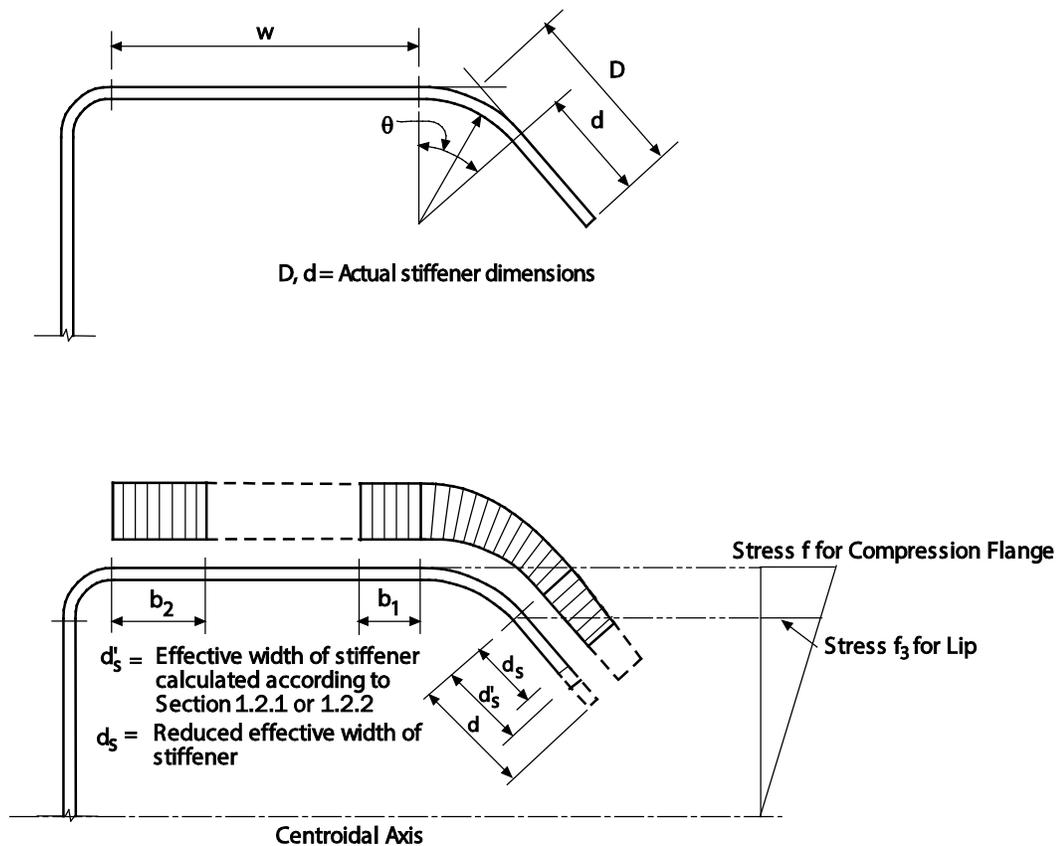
Element With Simple Lip Edge Stiffener
